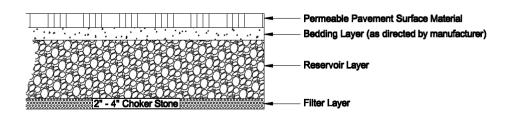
Cross Section of an Enhanced Standard Permeable Pavement Design without an Underdrain.
